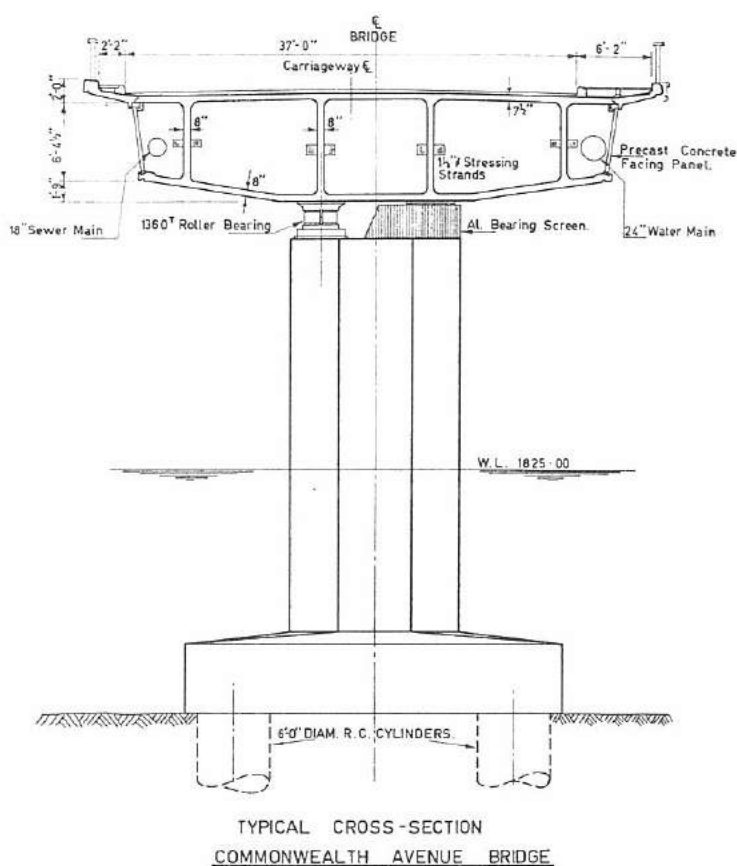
Commonwealth Avenue Bridge—Cross Section.
